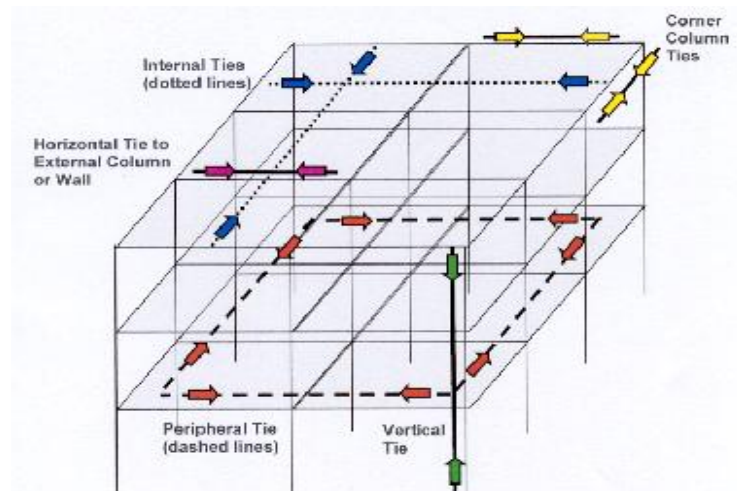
Schematic of tie forces in a skeletal or bearing wall structure
